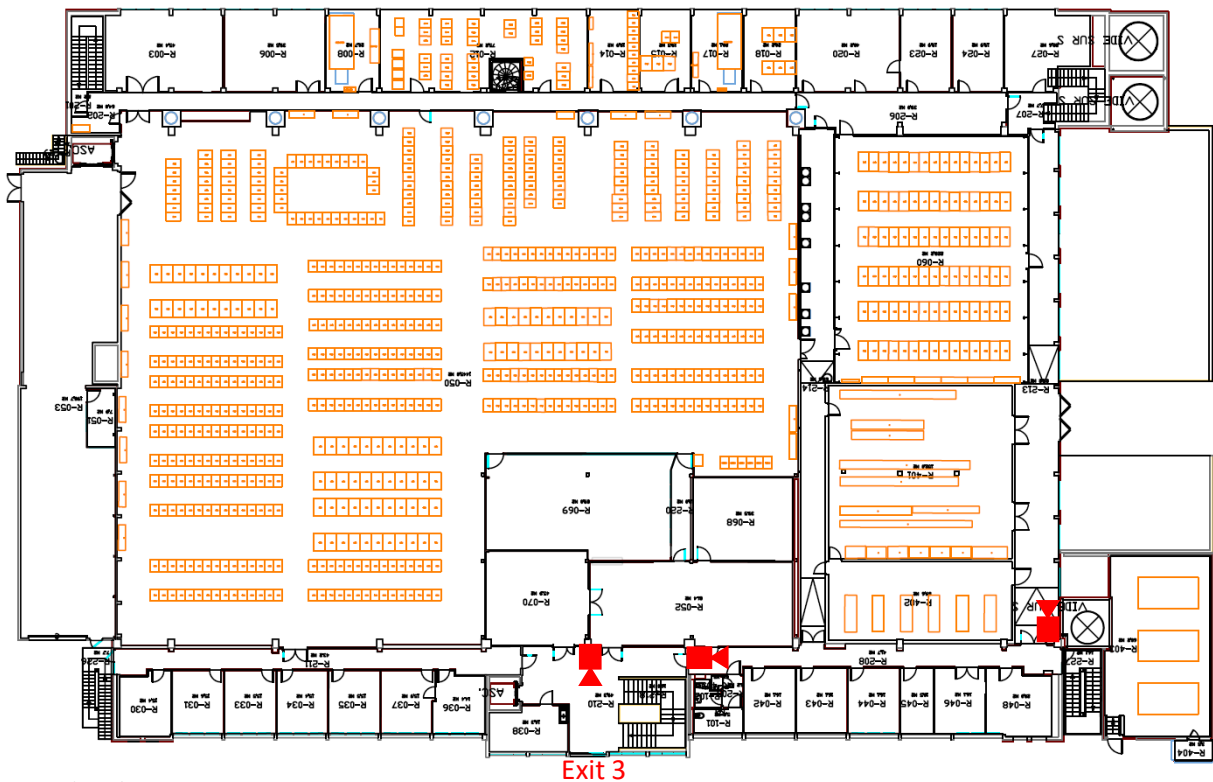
floor R0 layout, the locations and orientations of cameras, and the locations of emergency exits within this floor – building 2
